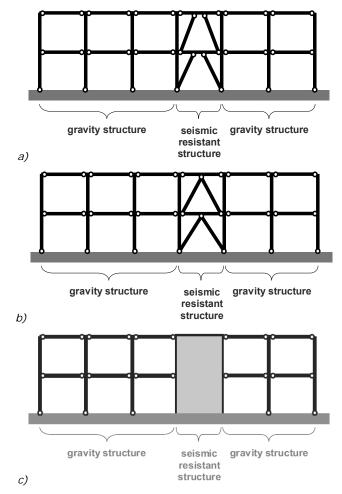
Structural scheme for commercial buildings: (a) eccentric braces; (b) concentric braces, (c) prefabricated shear walls.
